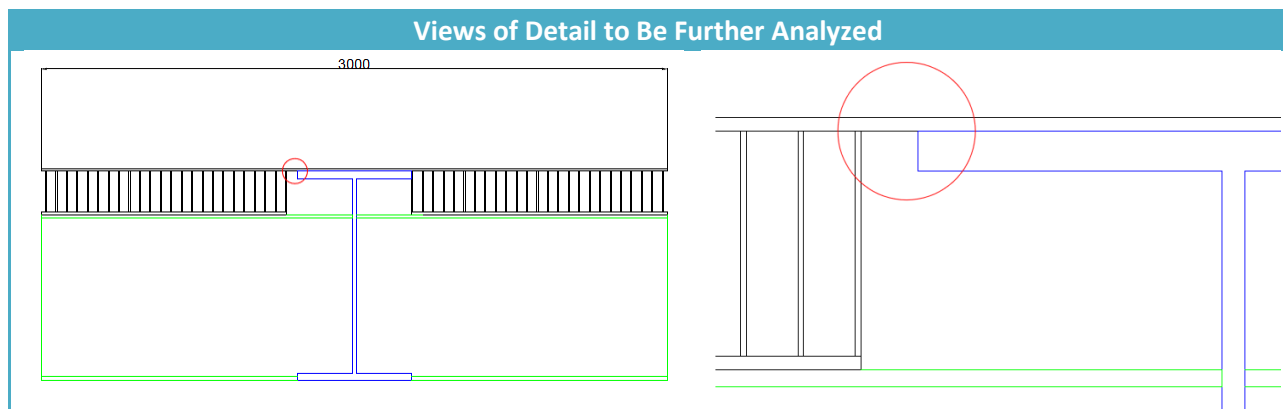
(Left) View of Deck Laid Over Girder, (Right) Close-up View of Detail to be Considered. Red Circle Marks Detail in Both
